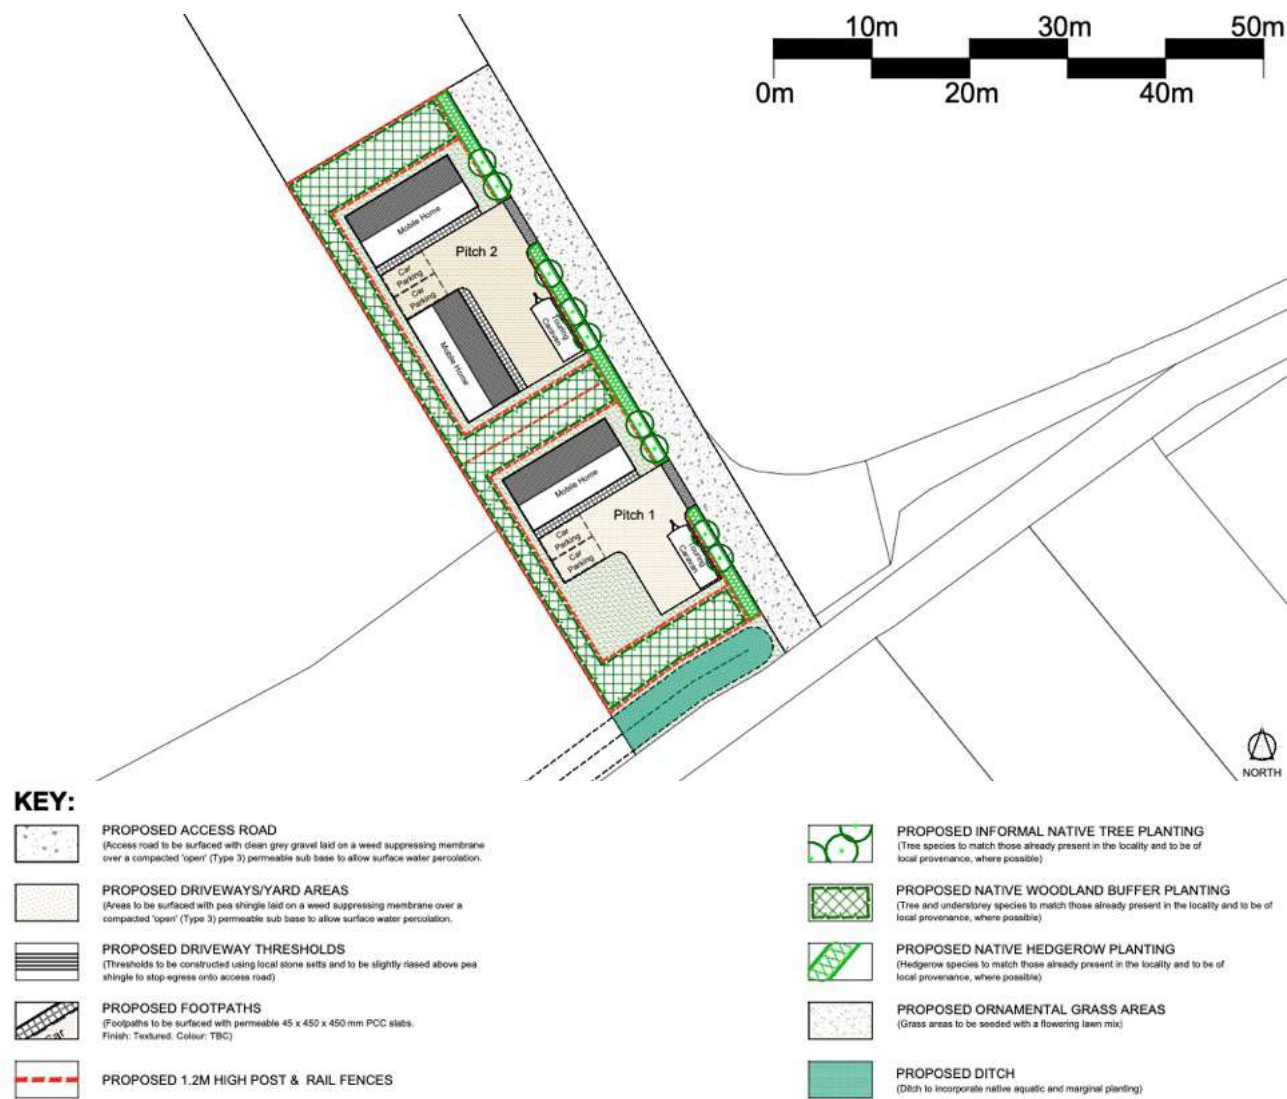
DEVELOPMENT PROPOSAL (PROPOSED LAYOUT)
